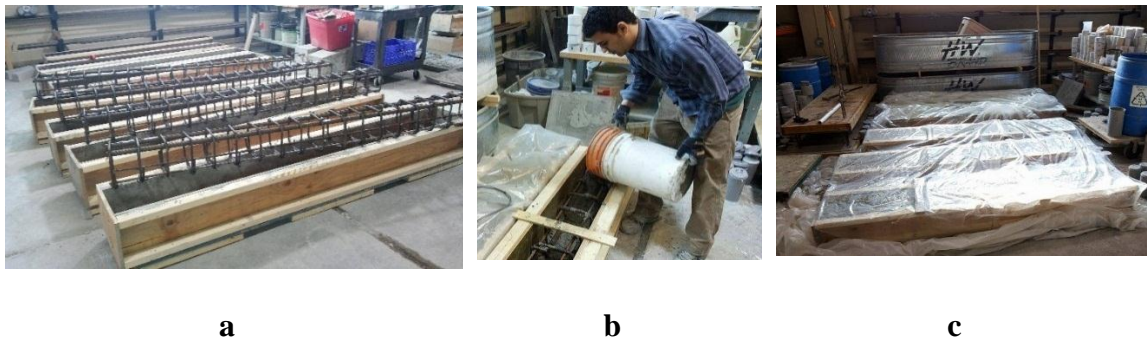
Casting of flexural beams (a) reinforcement and formwork details, (b) pouring concrete, (c) curing regime (first 4 days)
